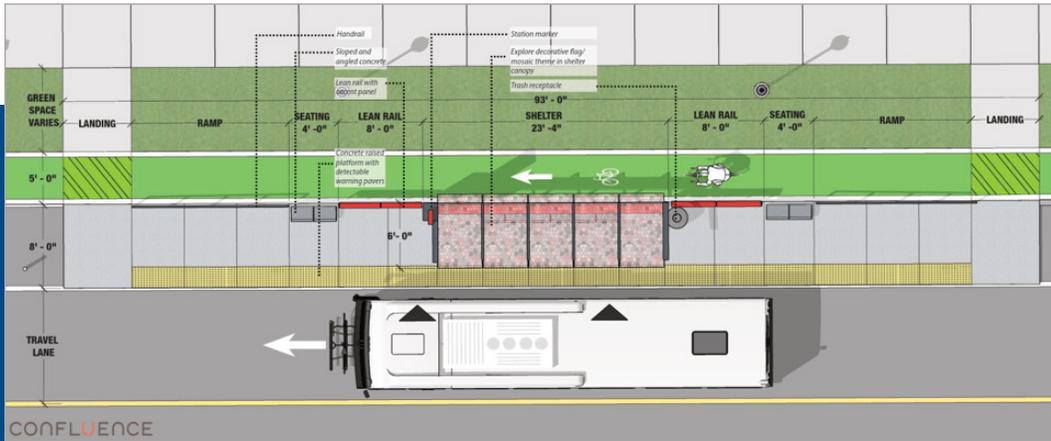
(left): Conceptual Independence Ave. BRT Station Layout
